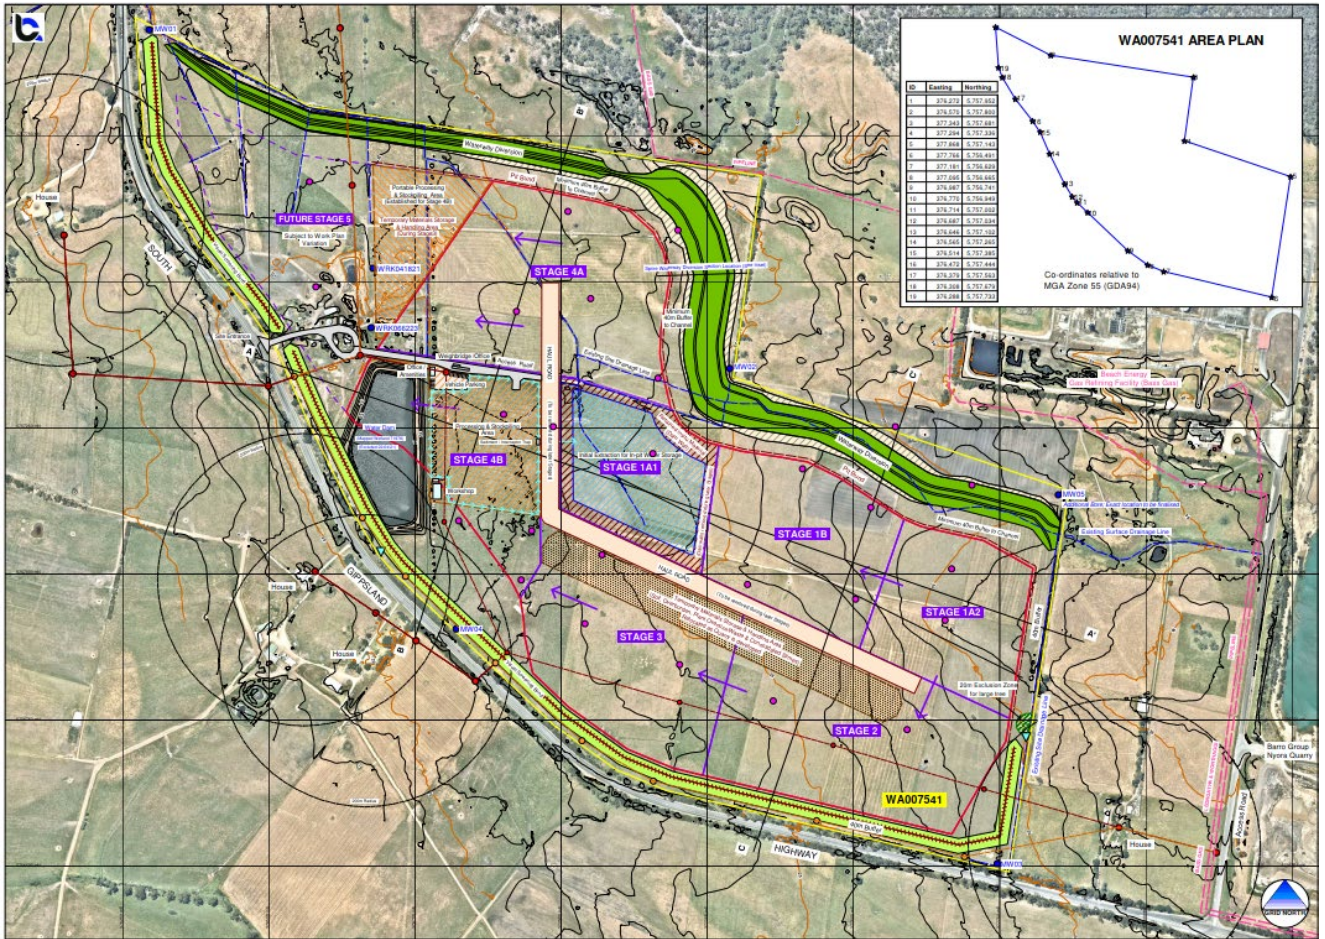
Site Layout Plan (Source: BCA Consulting, 2023)
